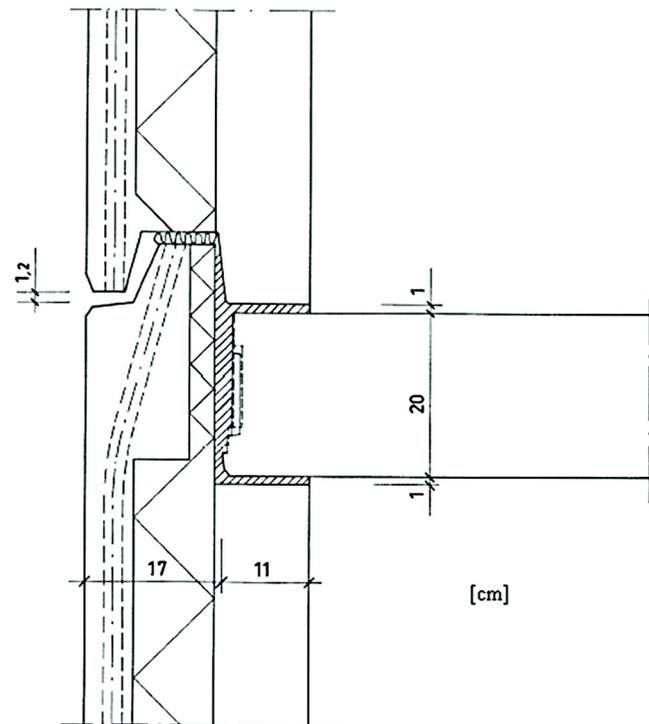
Wall modules of the Skarne system connecting with the floor slab (Sjöberg and Wichlaj 2007).
